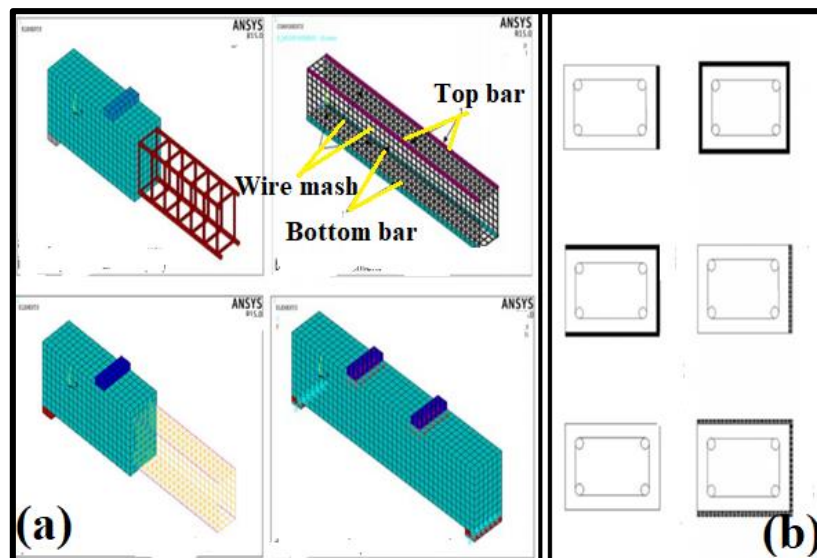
Reinforcement of beams with ferrocement (a- Form of reinforcement, b- Reinforcement type) (Zisan et al., 2023)
